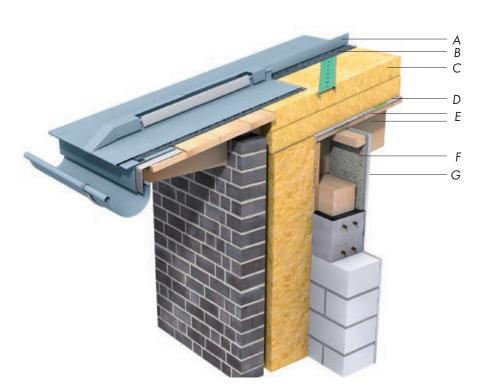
Construction example with installation of Click Roll Cap system on Rockwool® Prodach insulating system
